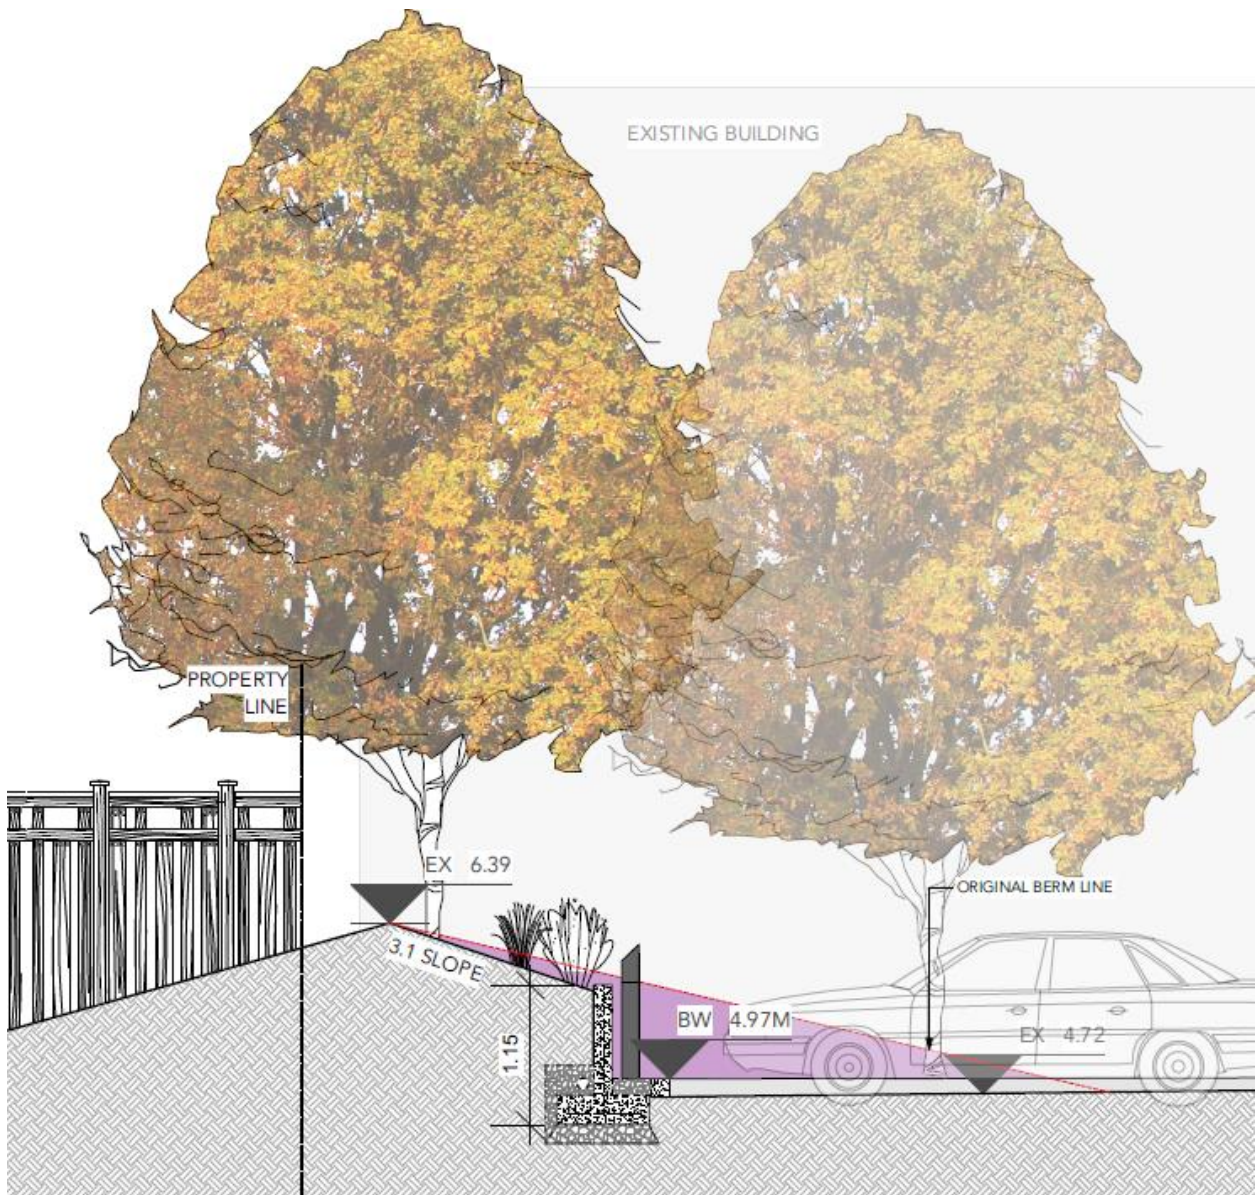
Cross-section of proposed retaining wall (berm to be removed in purple)
